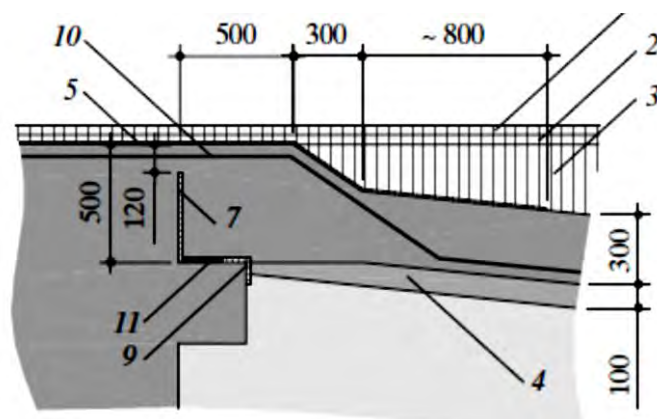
Detail of abutment/transition slab for integral abutment bridges according to Swiss recommendations (Dreier et al 2011)
